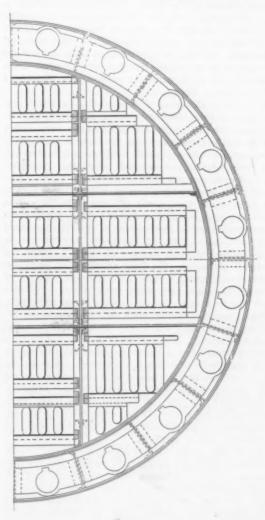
Half Rear View of the Hastings Tunneling Shield.
